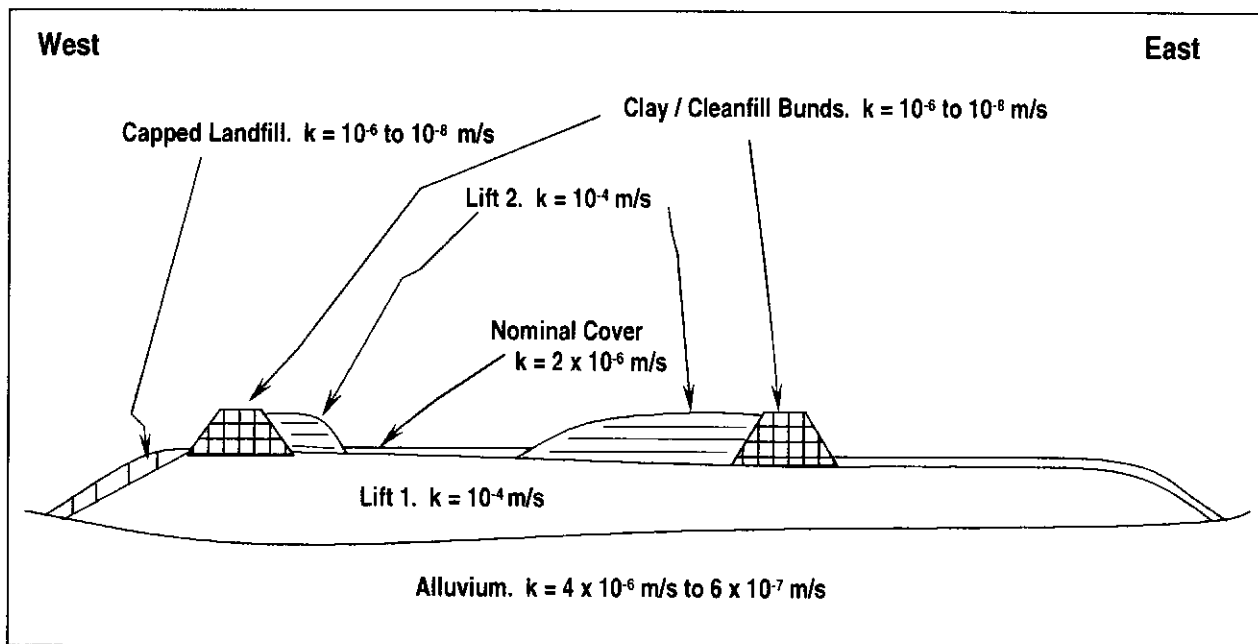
Schematic Cross-Section through Landfill Showing Typical Permeability Rates
